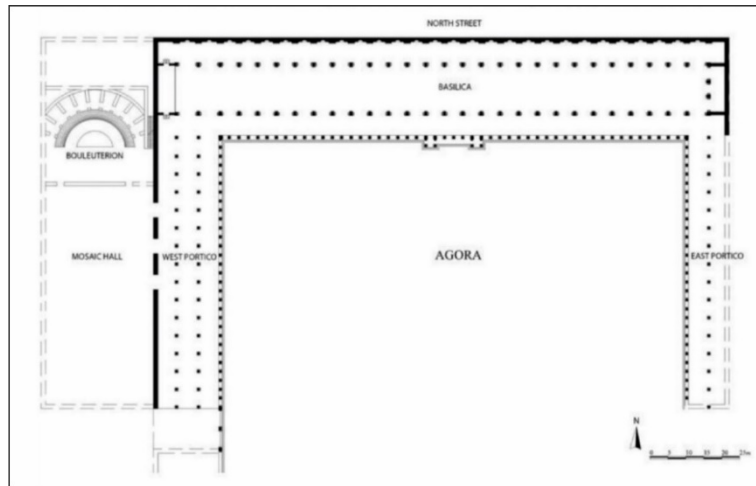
Plan of the Agora of Smyrna and its buildings (Yolaçan 2016).
